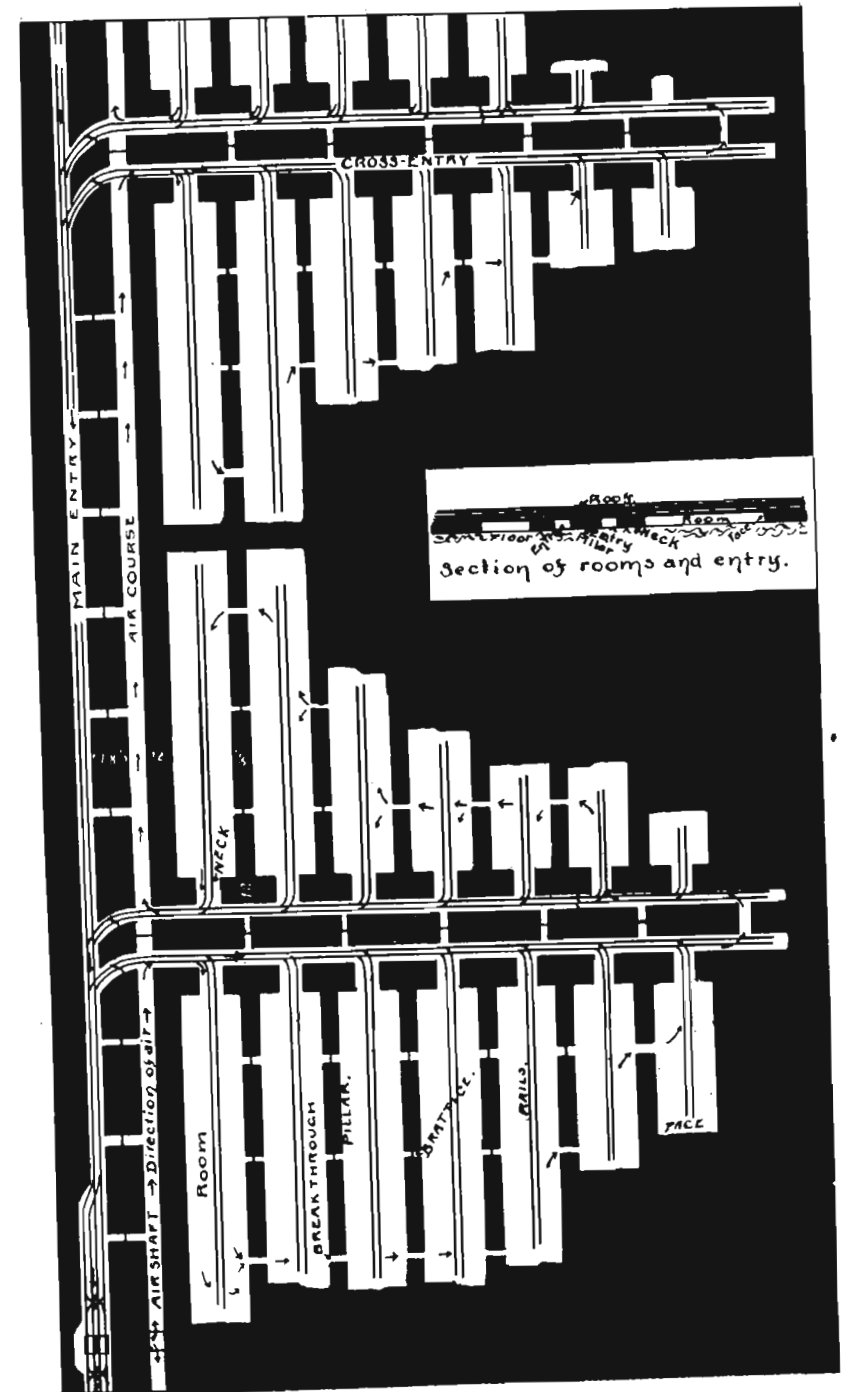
PLATE LXXXIV. Typical plan of room and pillar mine as commonly followed in Indiana.
